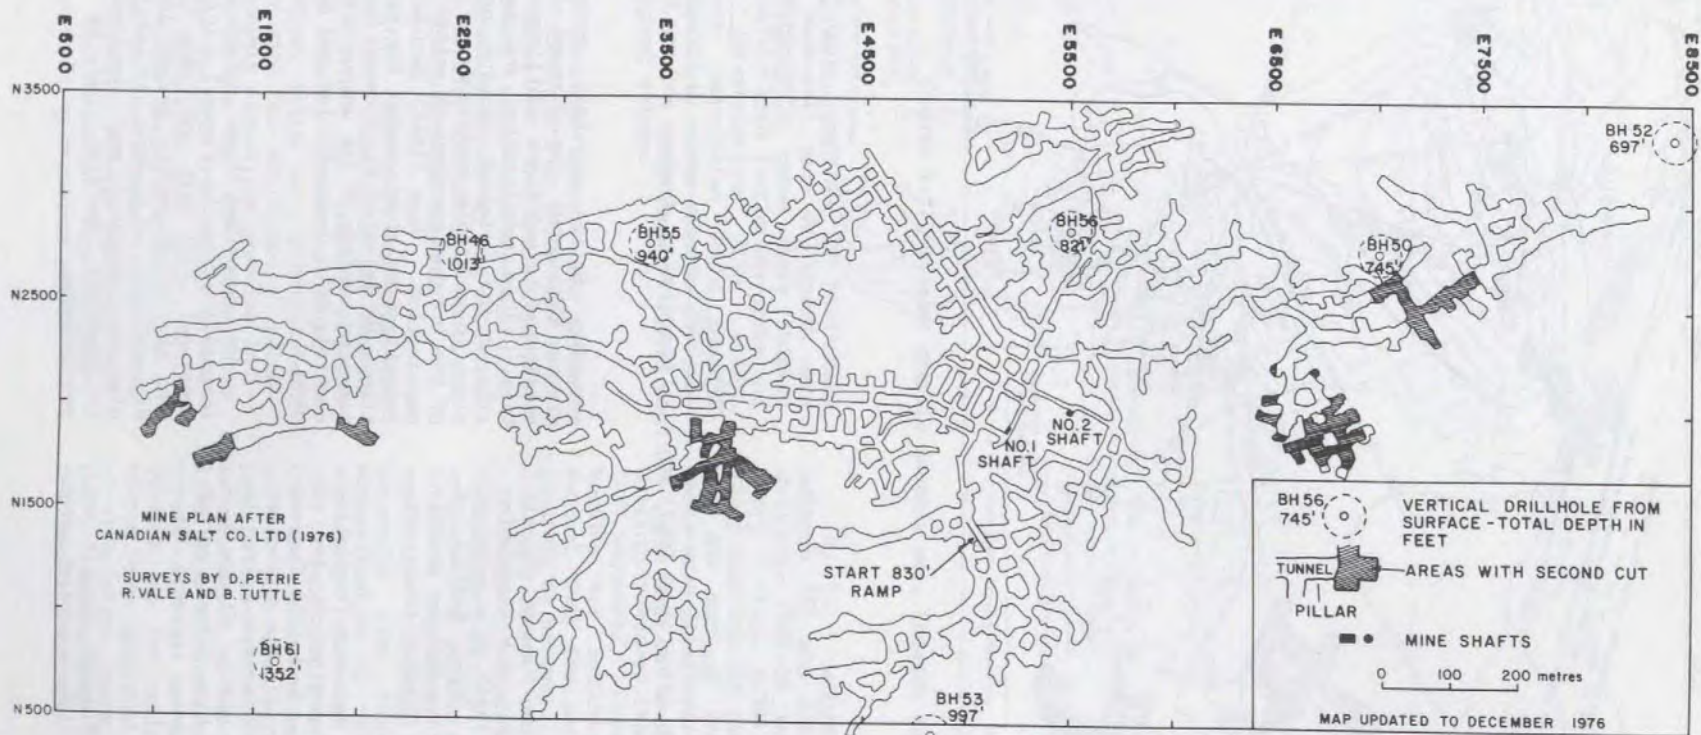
Updated mine plan, 630 foot level, Pugwash Mine.
